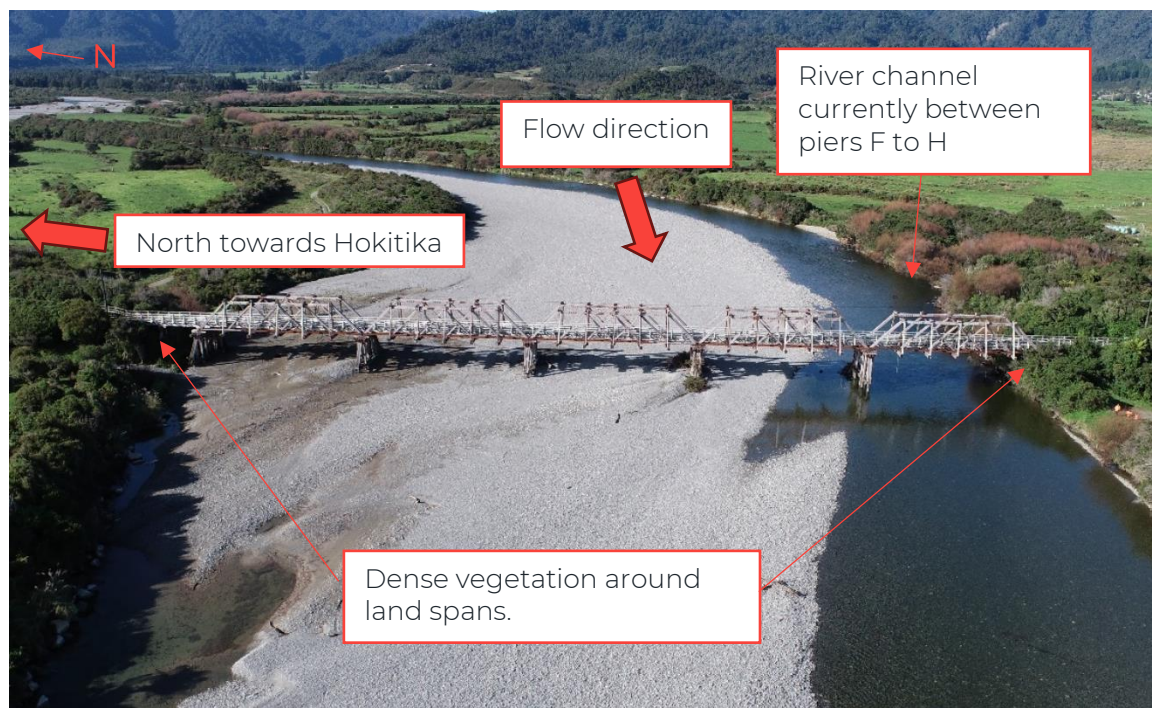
Overview photo of the Totara Bridge showing general site conditions
